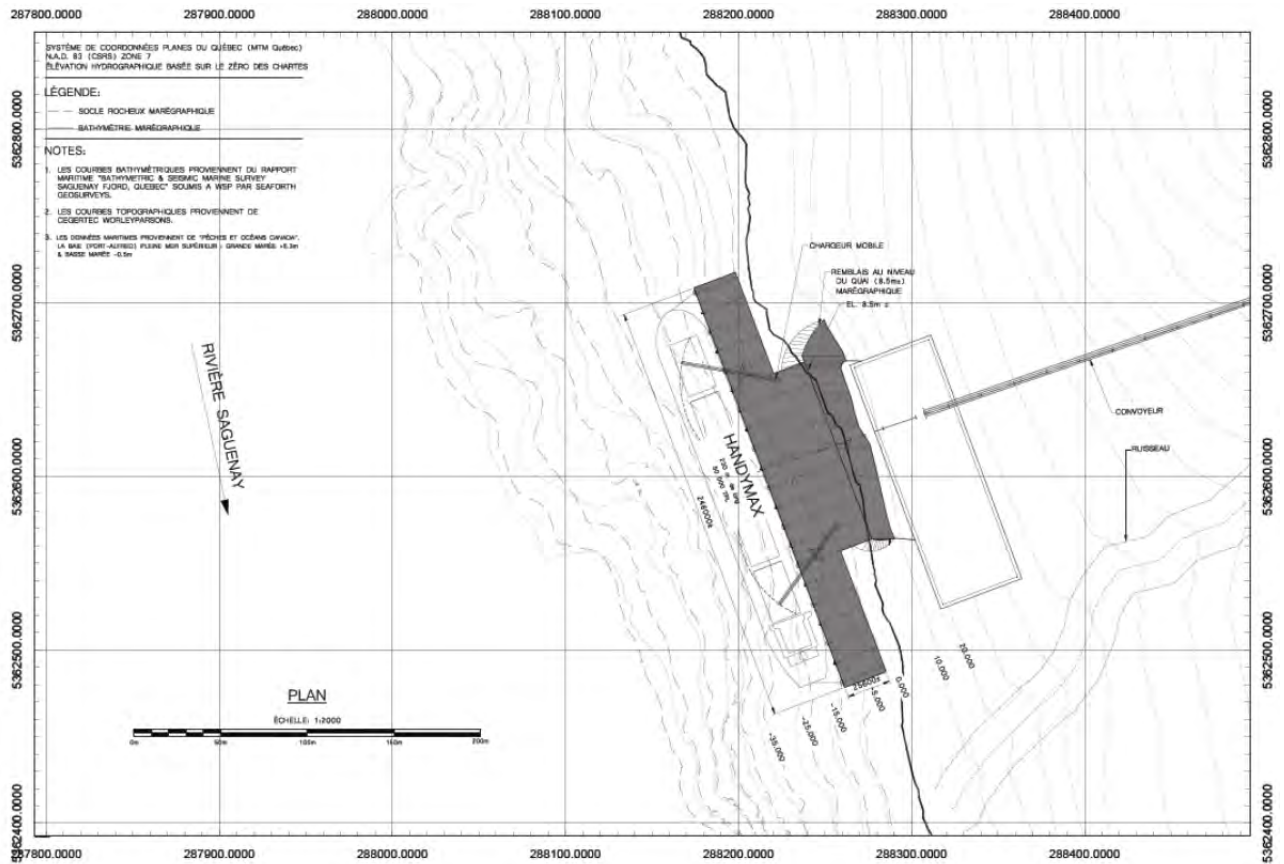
General layout of the proposed loading wharf (courtesy Portha).
